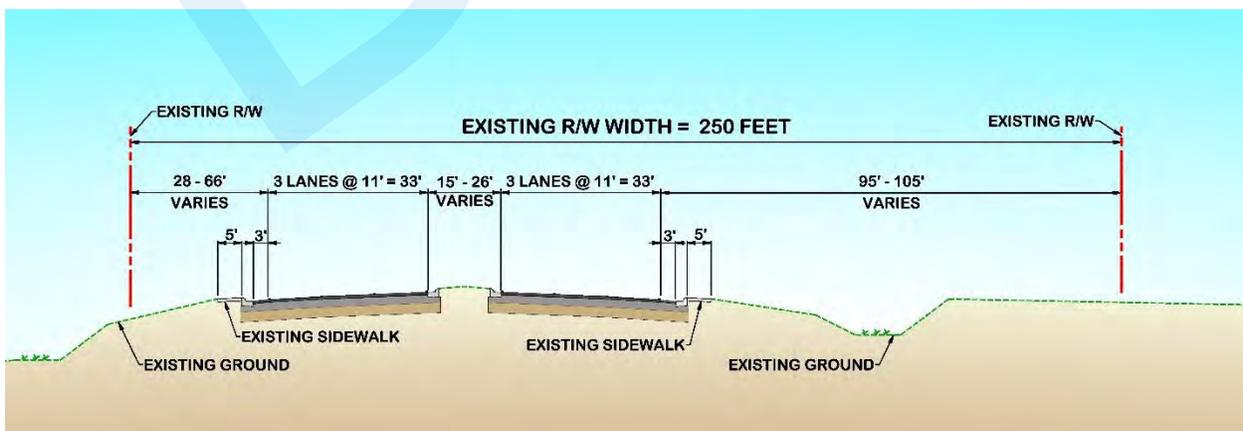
Existing SW 10th Street Typical Section - Military Trail to East Newport Center Drive
